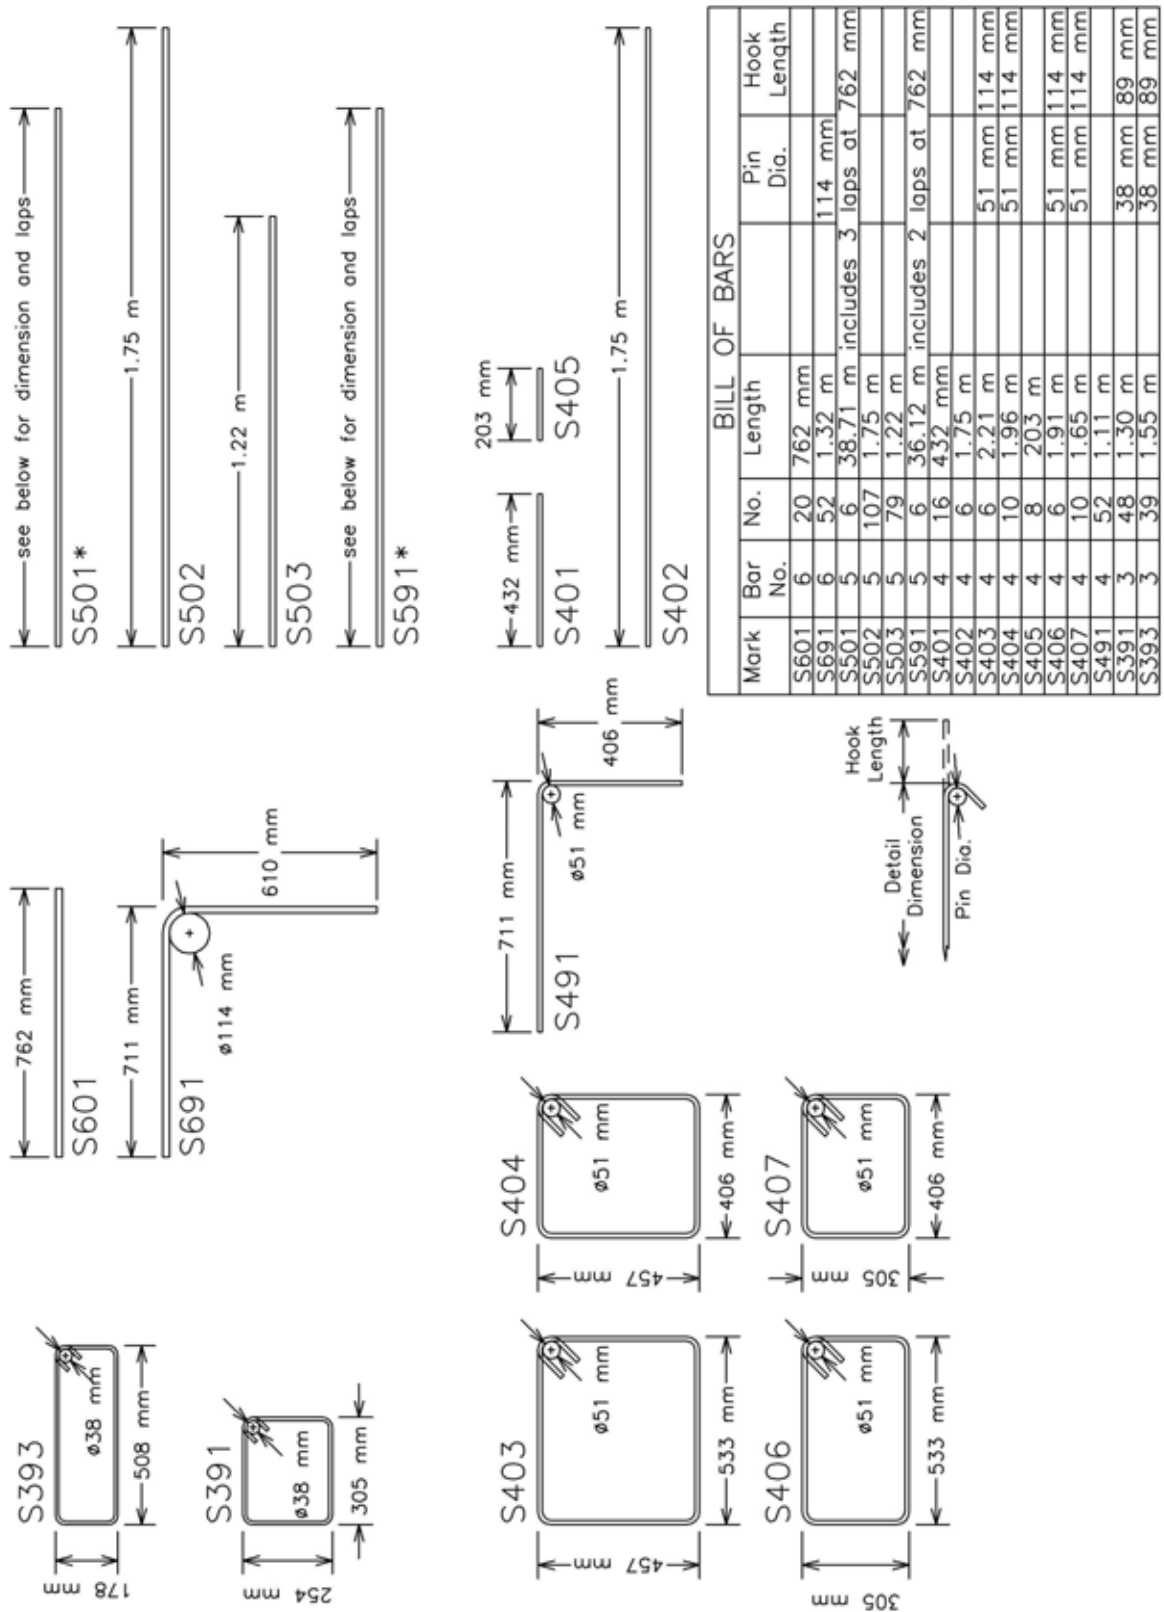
OCR Bridge Rail on Inverted Tee Bridge Deck Bill of Bars
